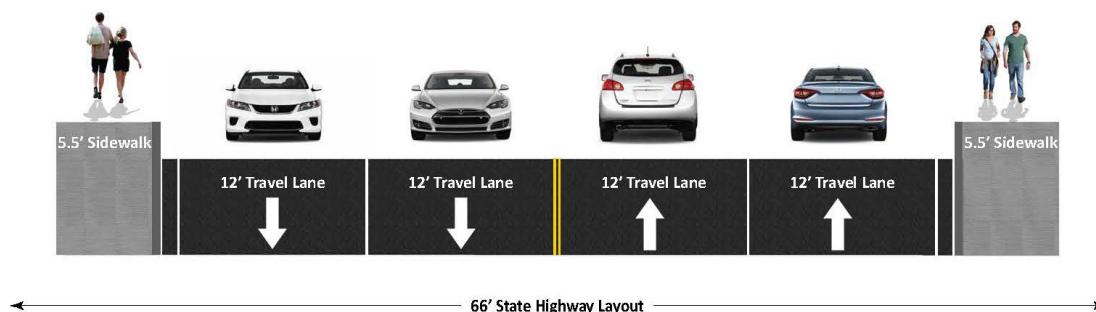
Typical Cross-Section of Main Street with Pedestrian Connectivity Improvements
